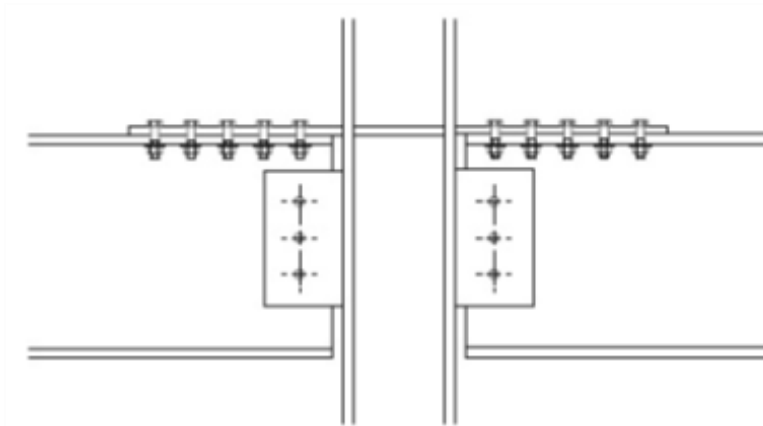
Top plate connection to transfer collector beam axial forces (Cowie et al., 2014)
